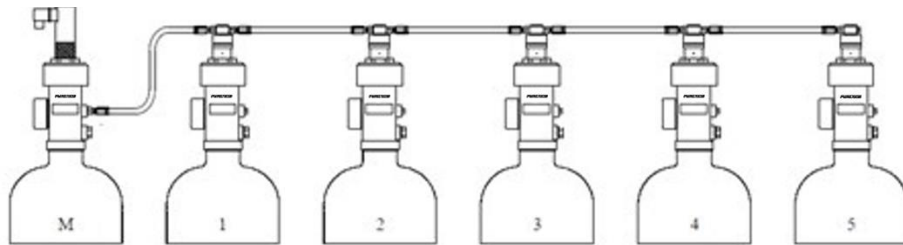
Maximum Number of Pneumatic Actuator for Welded Cylinders
